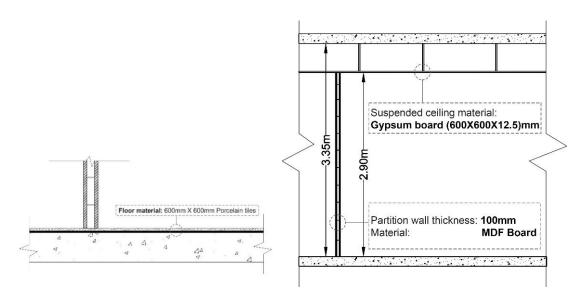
Detail of floor finish, partition wall and suspended ceiling
